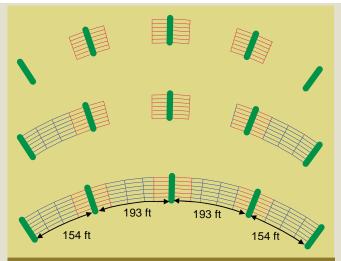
This erection sequence was proposed for a horizontally curved, precast, prestressed concrete girder bridge at the Interstate 480 overpass in Omaha, Neb. Note: 1 ft = 0.305 m.
